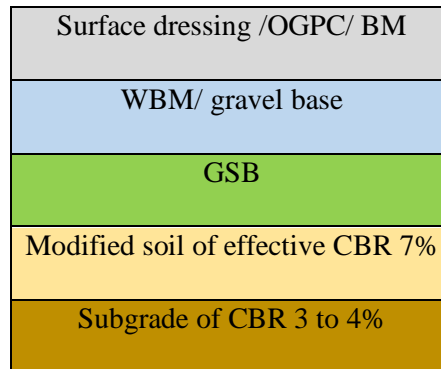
The cross-section of the low volume pavement consisting of granular layers
